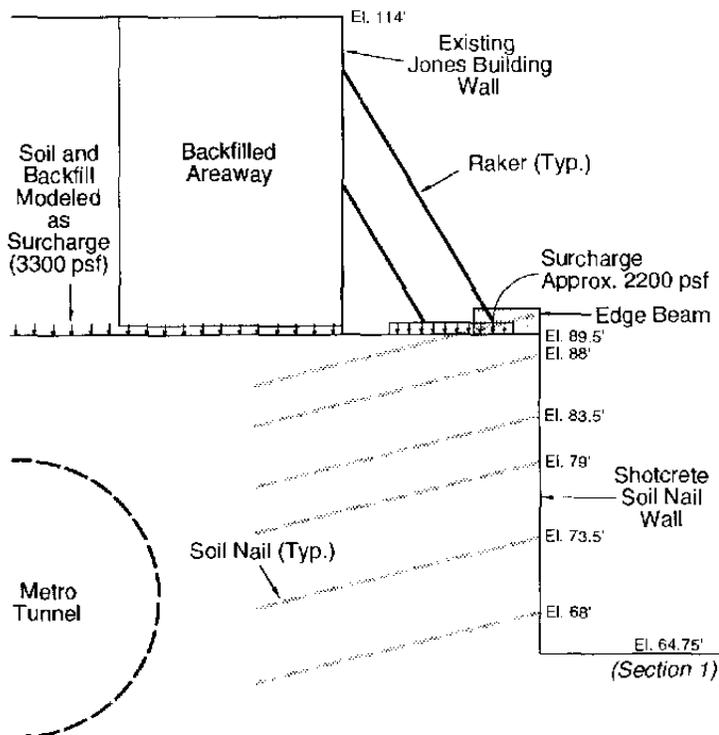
Soil Nail Wall Section 1 at Jones Building
